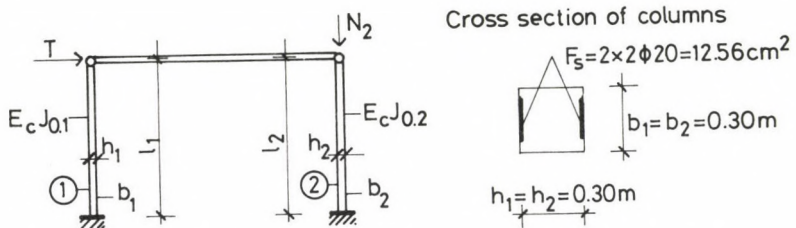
Column system consisting of reinforced concrete columns with normal force acting upon column 2
